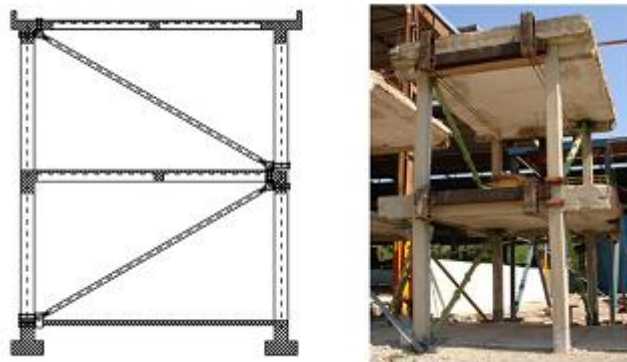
Reinforced concrete structure with structural braces in diagonal configuration (Mazzolani, 2008)
